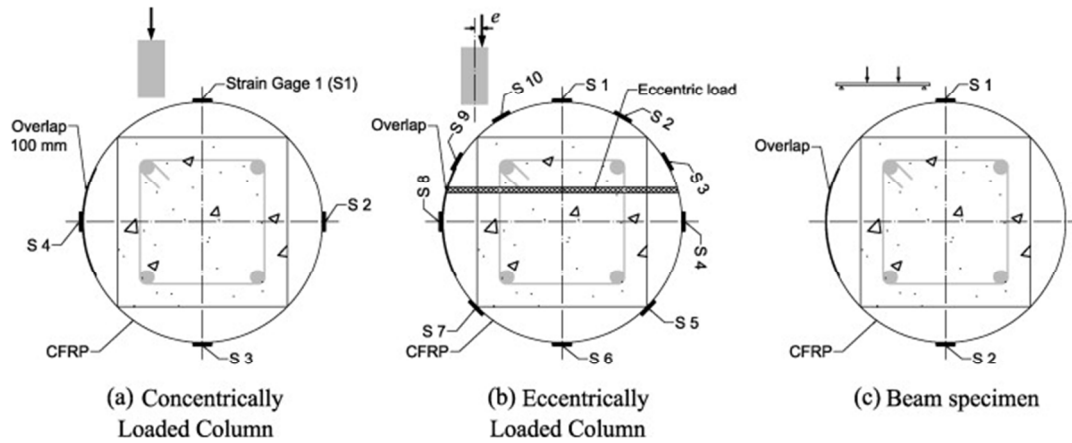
Details of loading conditions and gauge locations (Pham, Doan, & Hadi, 2013)
